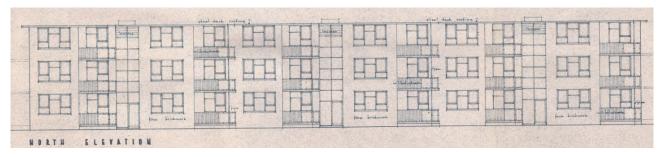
1960 drawings, north elevation (Source: Building File)
